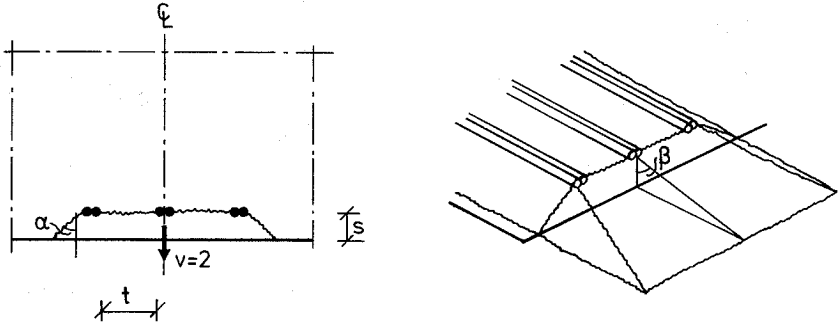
Wedge-plate mechanism; geometry and yield line pattern.
